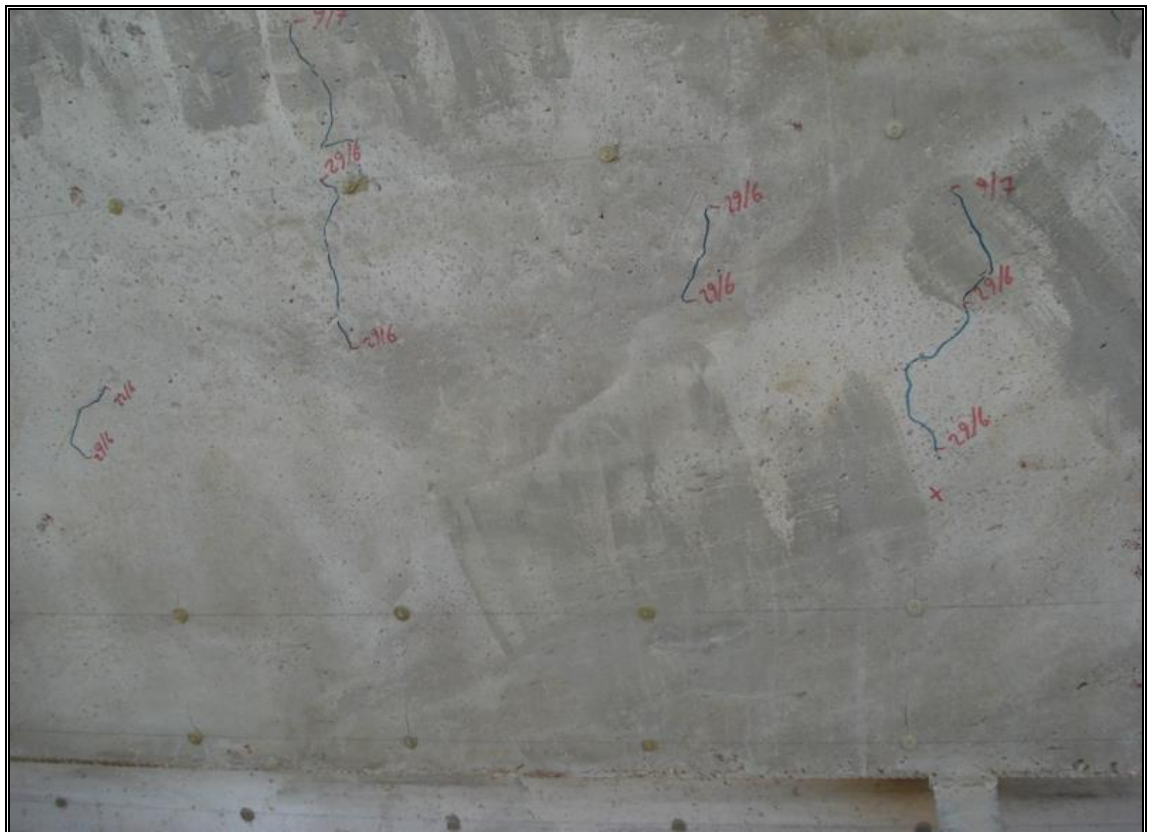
Final cracking pattern of second quarter of wall (4S)
